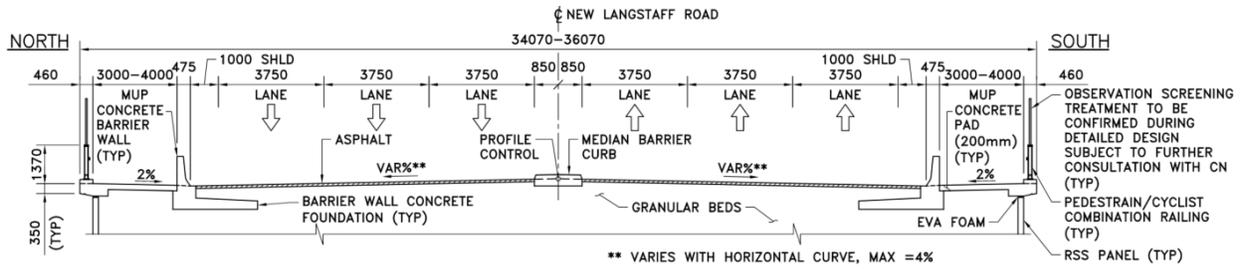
Proposed Cross Section – Approach Fill Sections – RSS Wall
